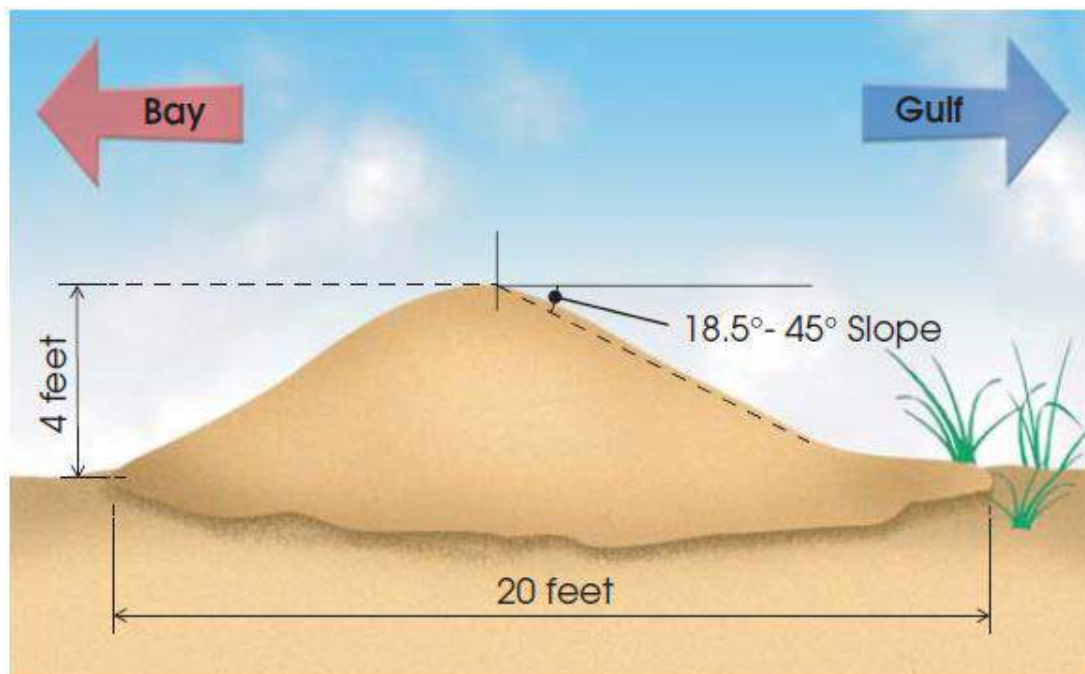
Minimum height, width, and slope of a dune constructed of imported sand.
